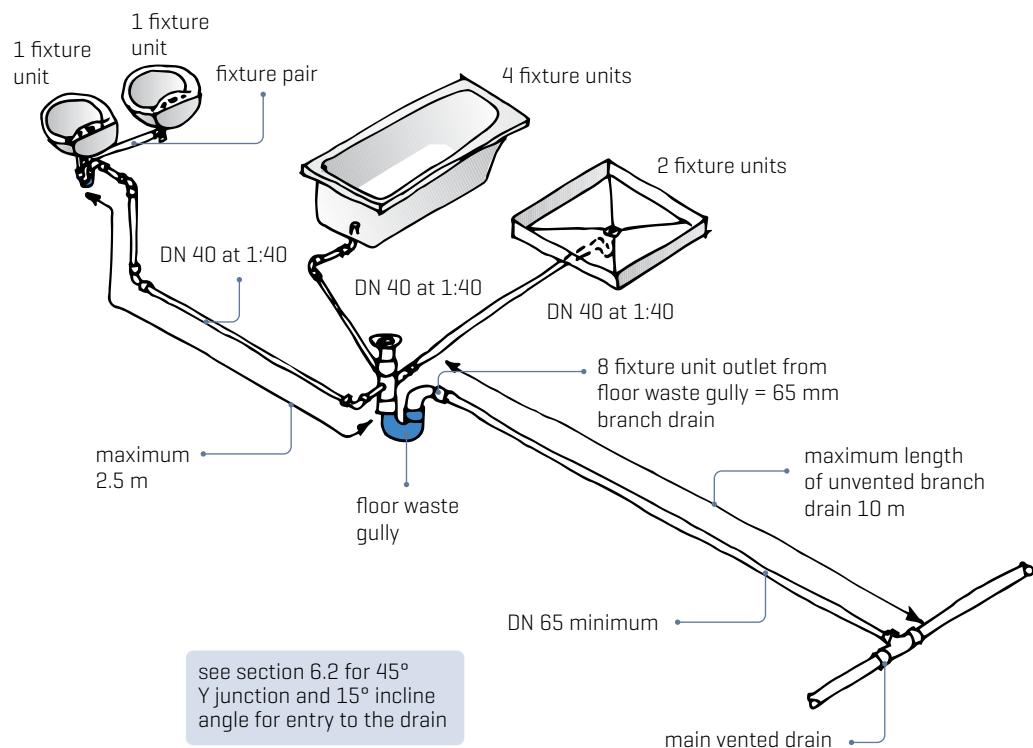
Maximum length of unvented branch drain receiving discharge from a floor waste gully.
